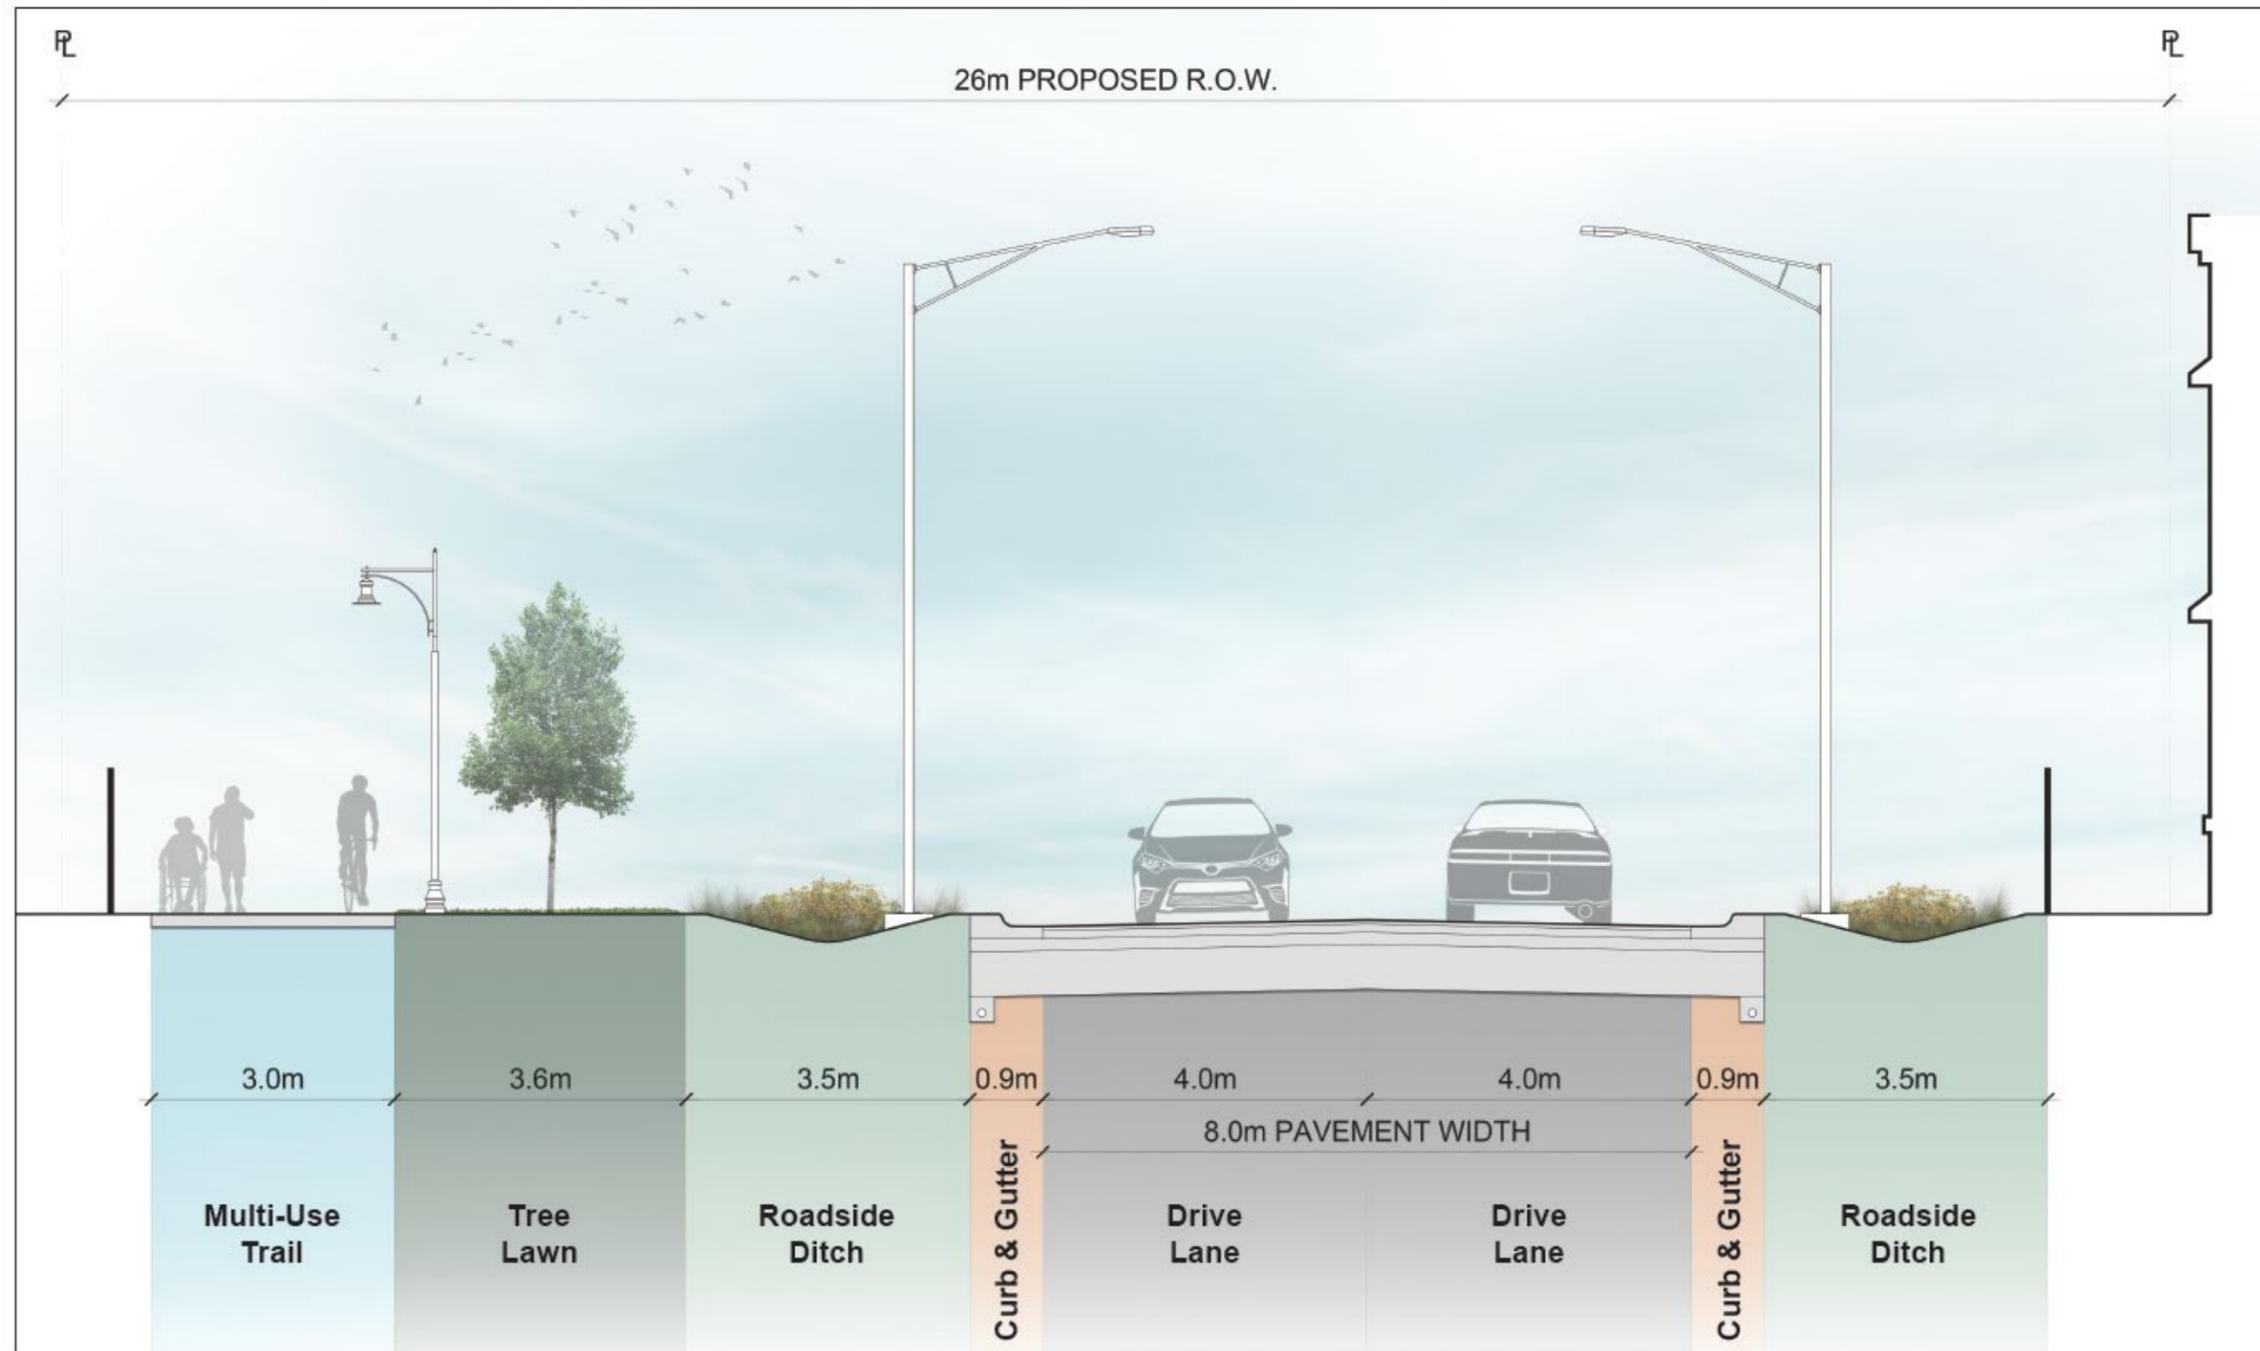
Downtown Commercial Street – Conceptual Application B (New Road)
